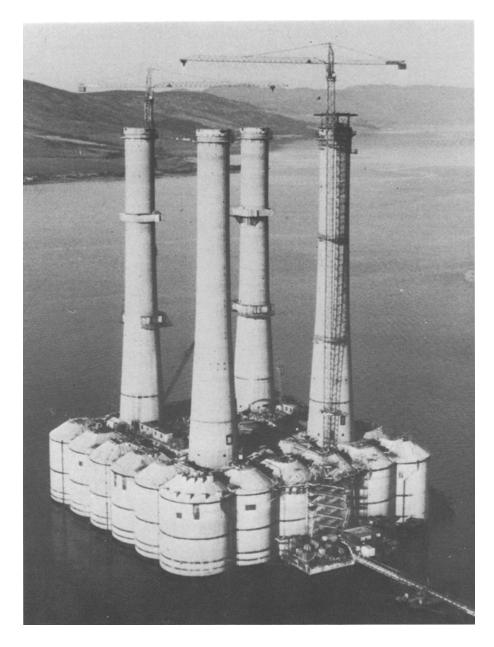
Concrete platform (Brent C) for the Brent field under construction at Ardyne Point in Scotland (by courtesy of Sir Robert McAlpine & Sons Ltd).
